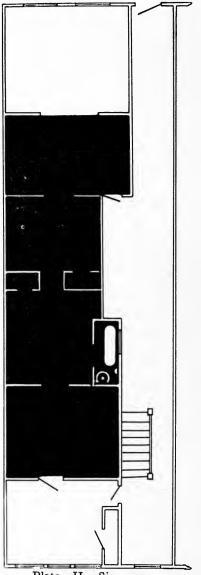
Plate II. Six rooms, one behind the other; outside windows only in front and rear. Note location of bathroom and toilet.
